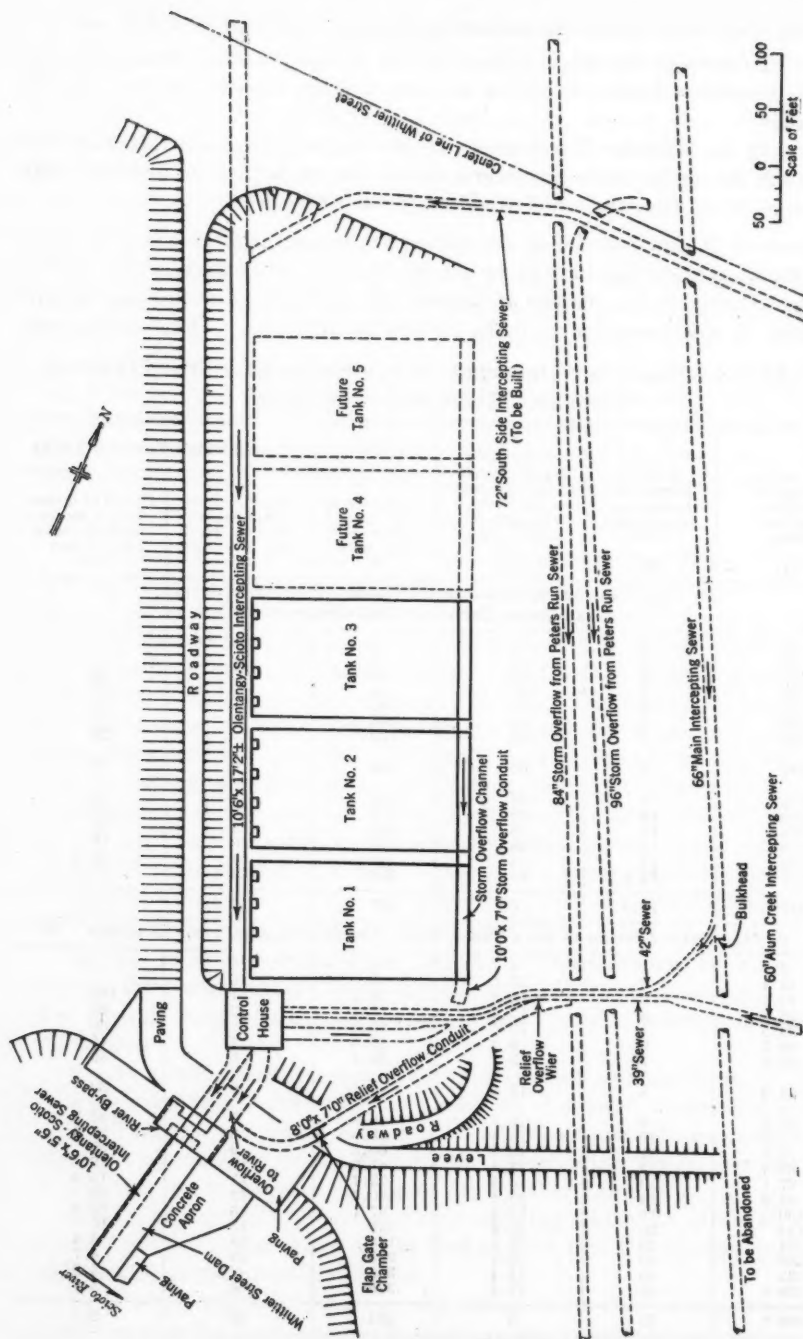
PLAN OF STORM STAND-BY TANKS, ON WHITTIER STREET, COLUMBUS, OHIO.
